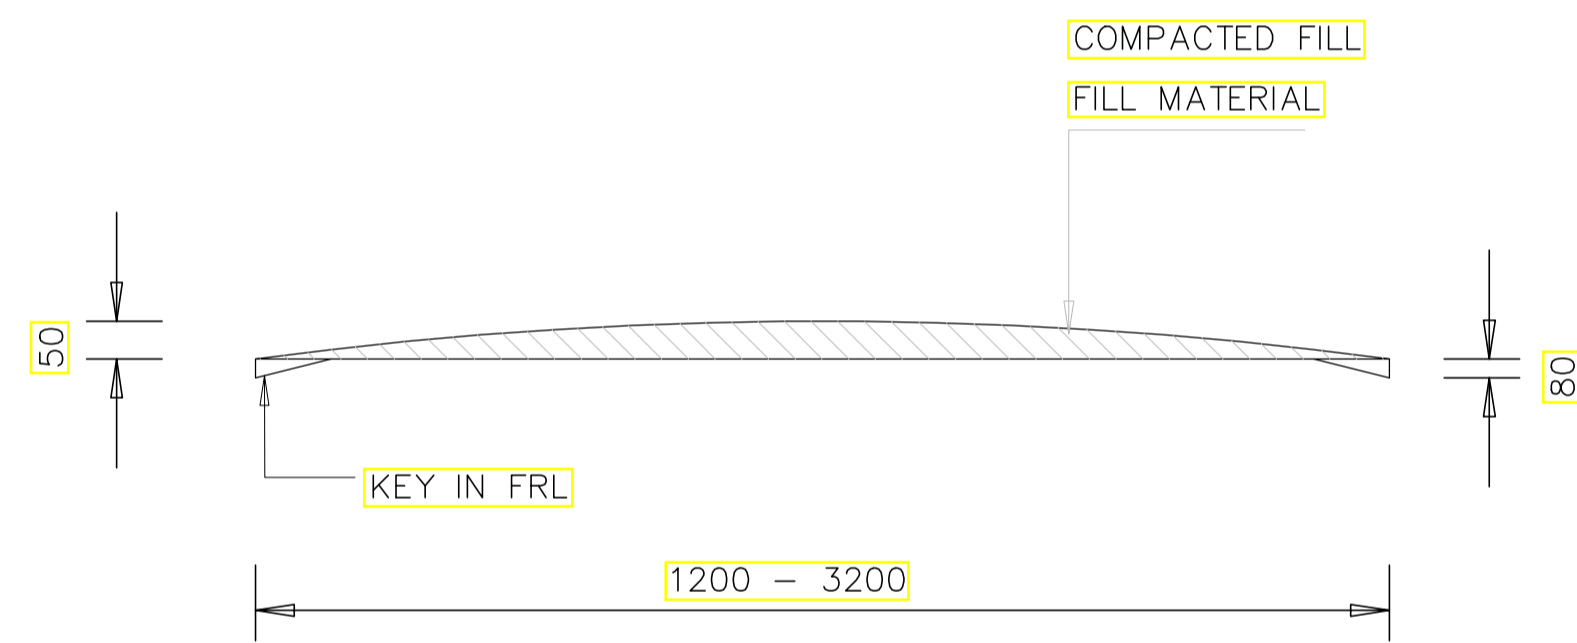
DETAIL OF MOUNTABLE KERB (FIG. 8C)
